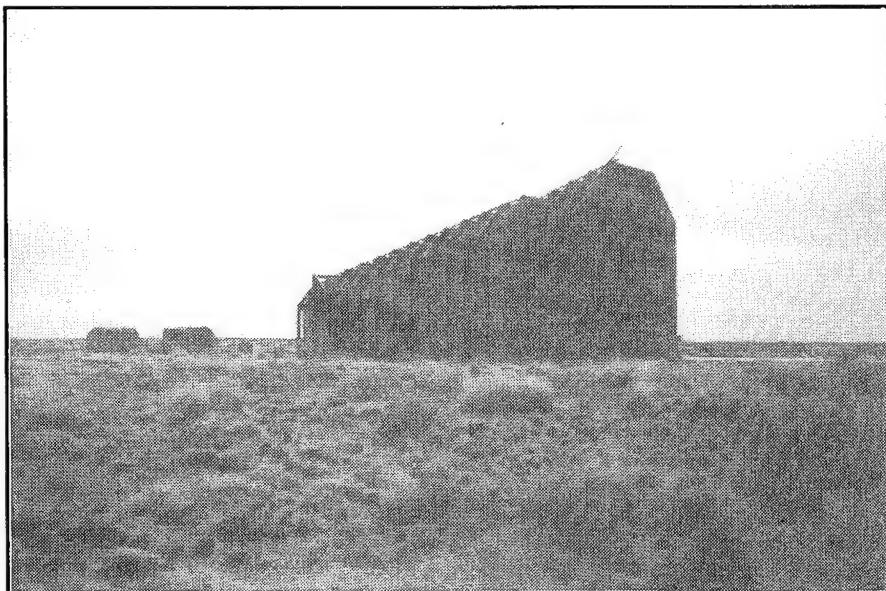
The Zel site, Building 1442, north and east elevations (Tagg/HAFB 1995).
